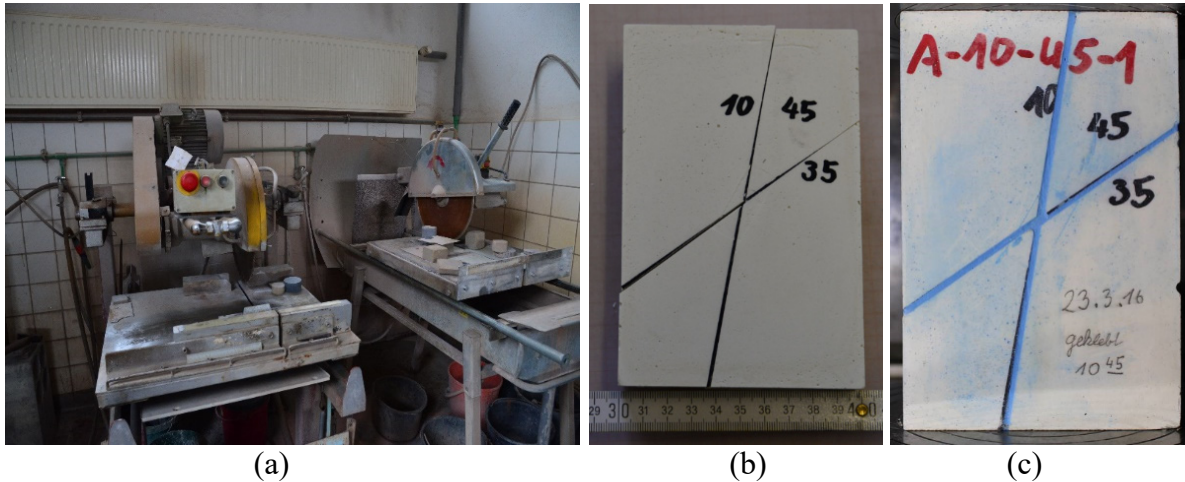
Sample preparation: (a) slicing machine, (b) specimen cut into pieces and (c) final sample with glued joints.
